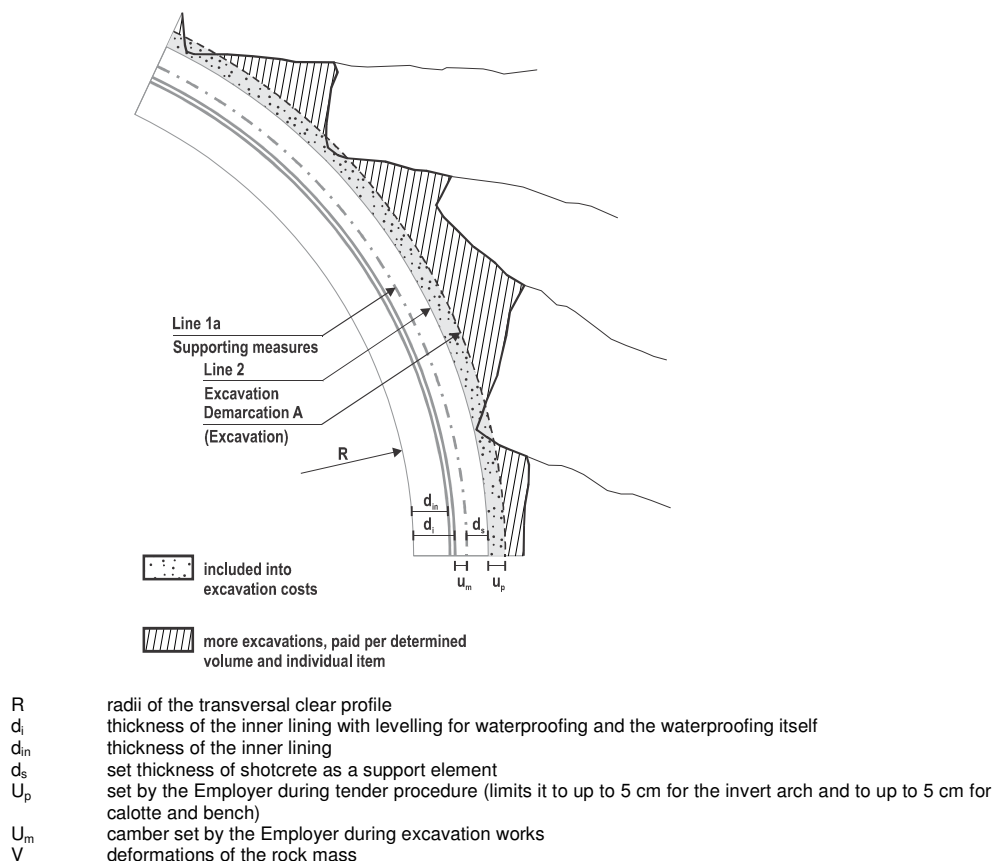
Calculation lines: excavation and support elements - layout prior to deformation
